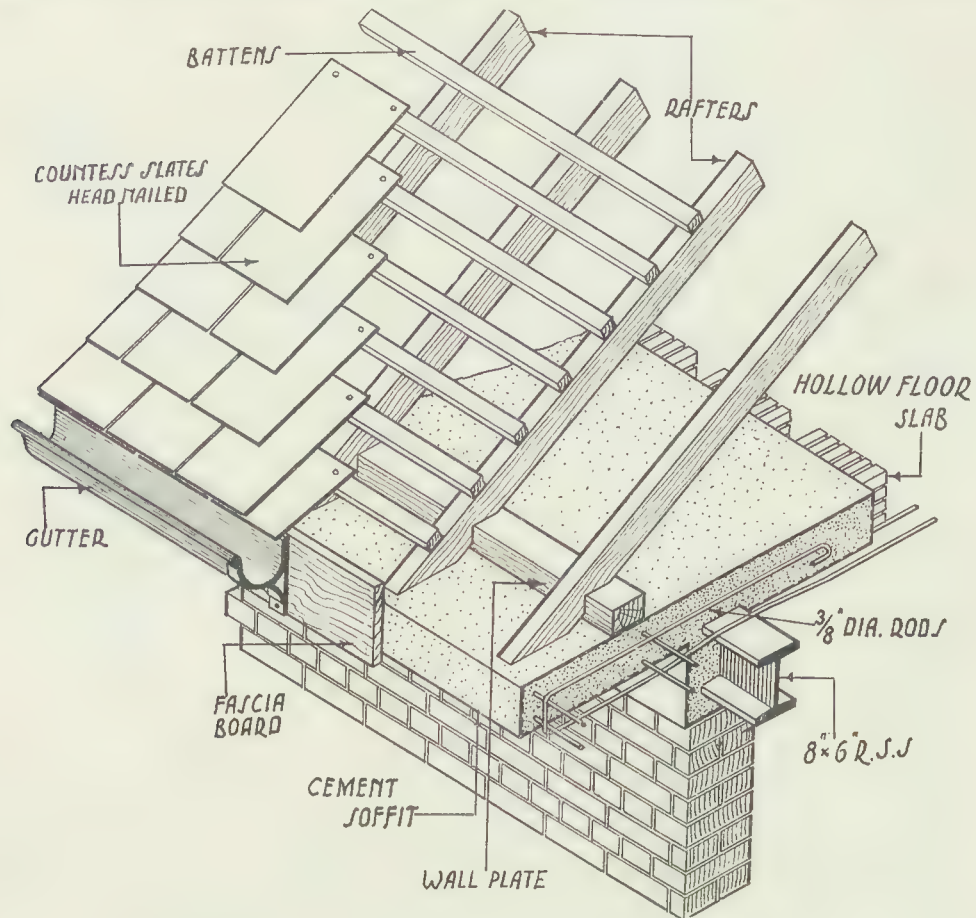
CONSTRUCTION OF AN EAVES WITH CONCRETE SOFFIT
